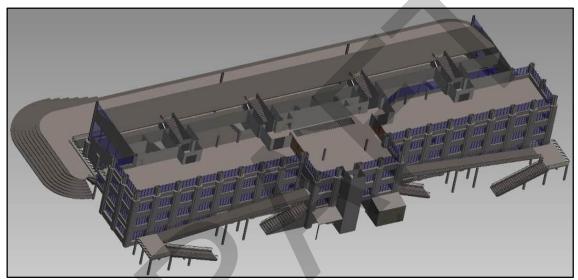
Cutaway showing walls and columns at the third floor level at GNS
